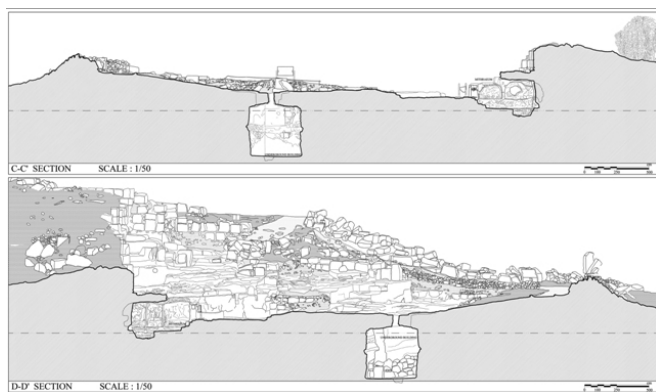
B. 1/50 Scale Plans of C-C' and D-D' Sections of the Mithraeum and Underground Building (Zerzevan Excavation Archive).
